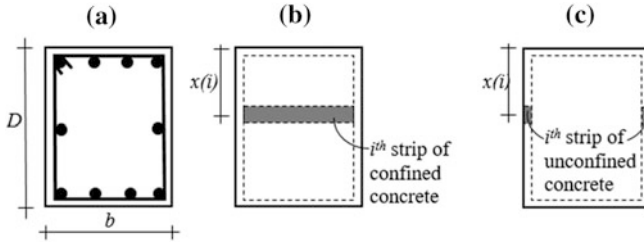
Sectional parameters for actual behavior: a cross section with reinforcement details, b typical strip for confined concrete, and c typical strip for unconfined concrete
